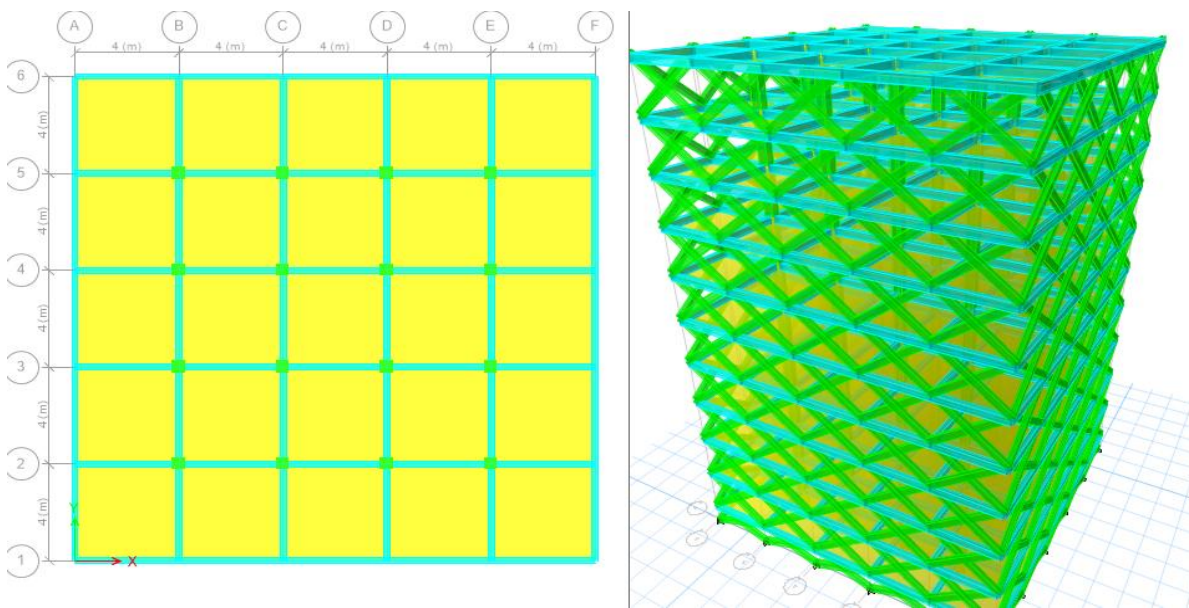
Plan and 3D view of symmetric Diagrid structure
